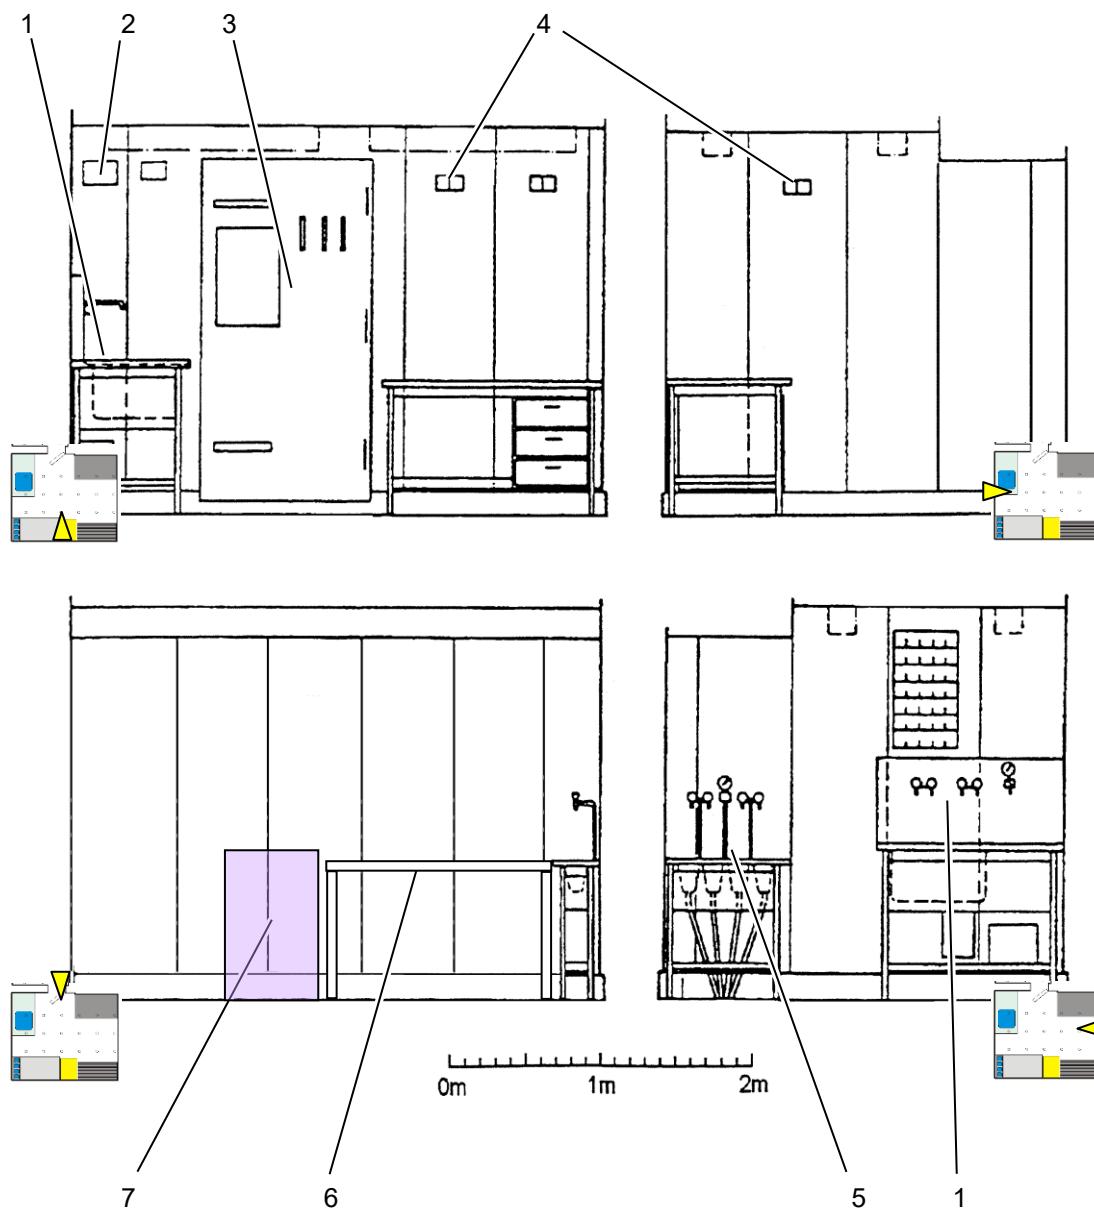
Aquarium refrigeration room (detailed plan laboratory walls, status 1986)
